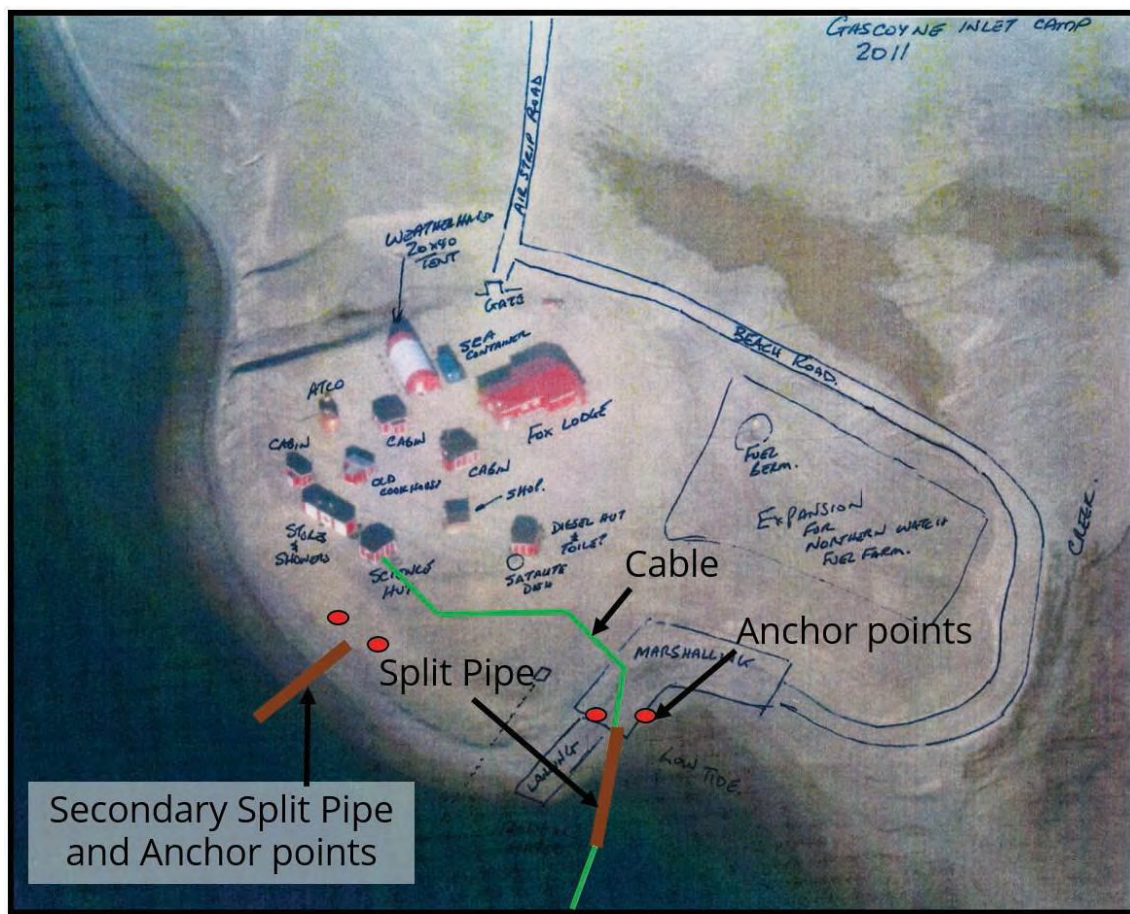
Top down view of DRDC camp showing cable and split pipe plan
